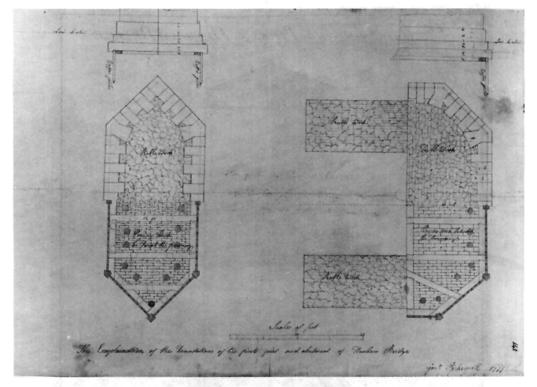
Pickernell's drawing of a piled pier and abutment (Design 2) Courtesy of the Royal Society
